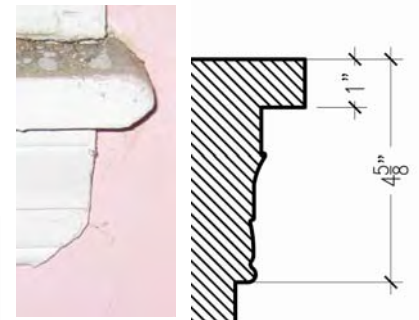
Window 104 sill type-2 photo and profile. (Photo: BBB, 2007)
